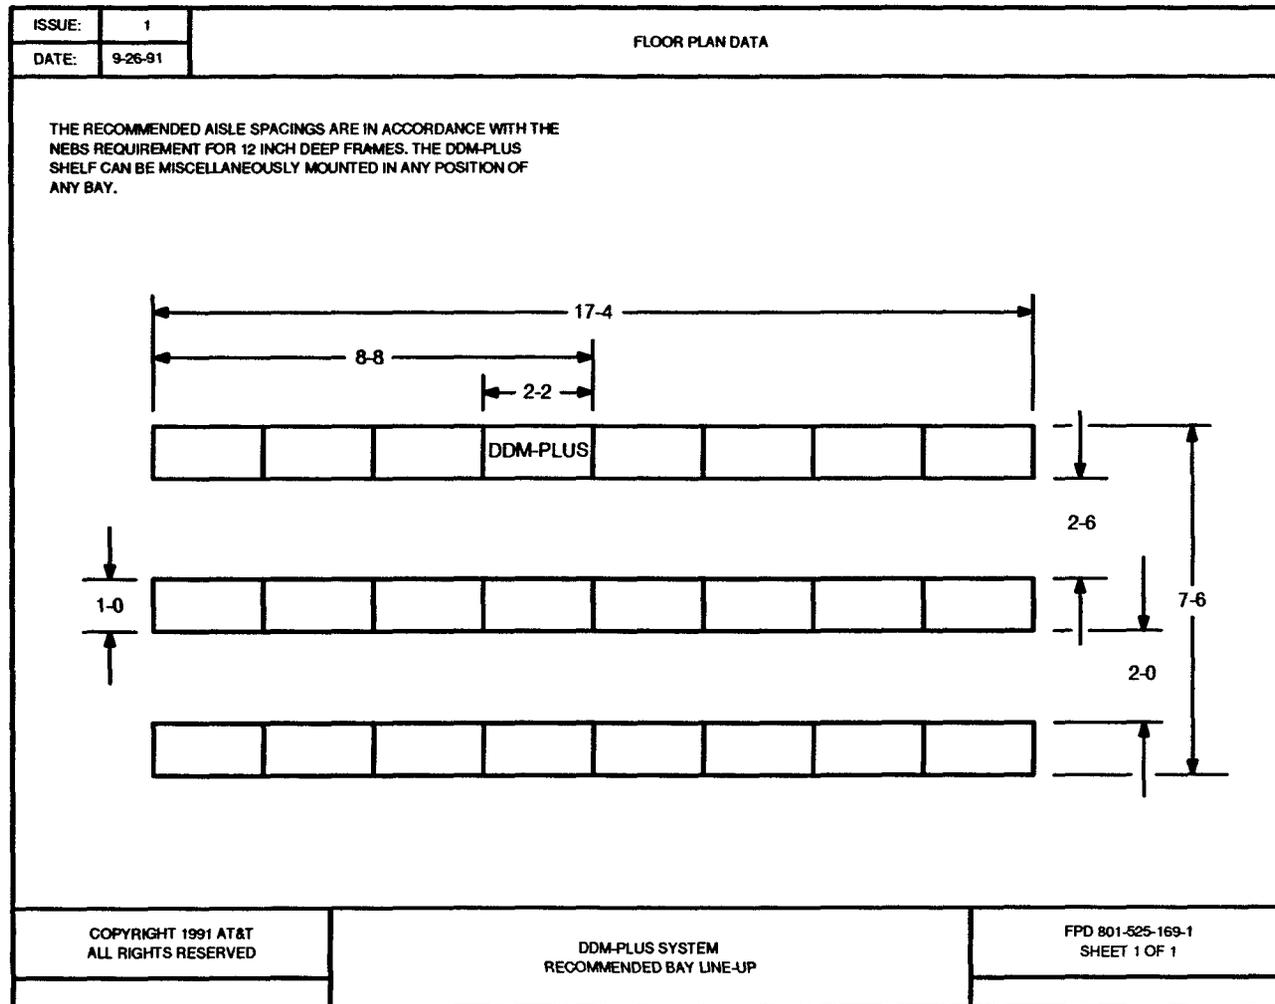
Floor Plan Data (Sheet 1 of 9)
